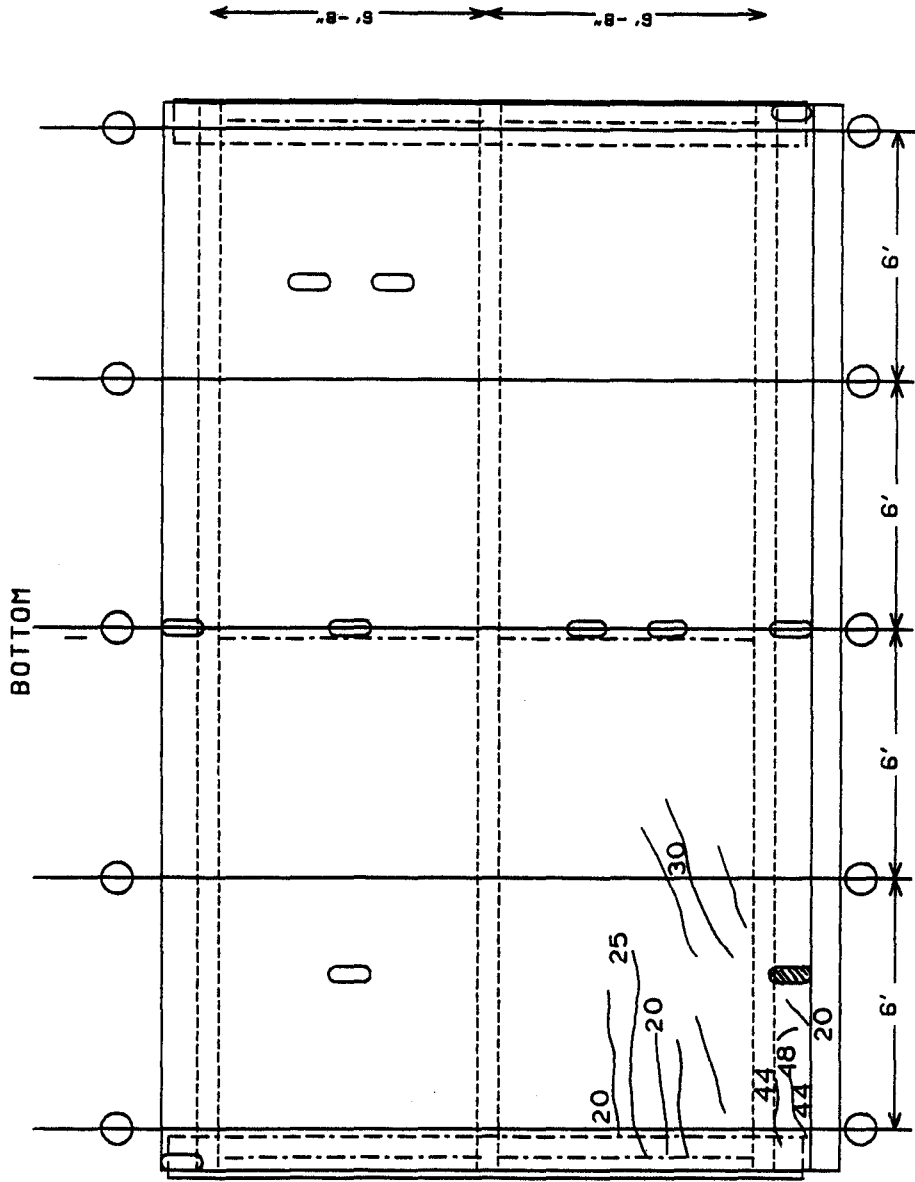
Bottom Cracking Pattern (First Bridge - Test No. 7)
